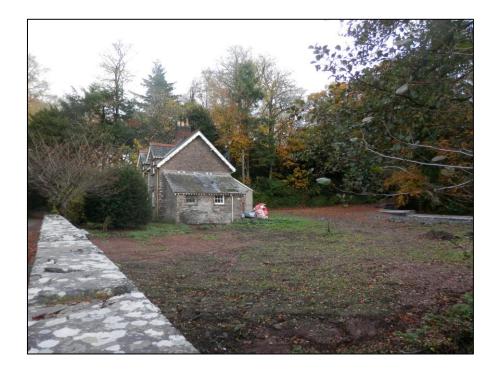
View looking ESE at the site of the proposed development from Pont Ffrwd Grech
